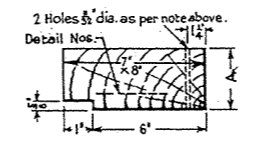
DETAIL AT JOINT IN FLANGEWAY TIMBERS
